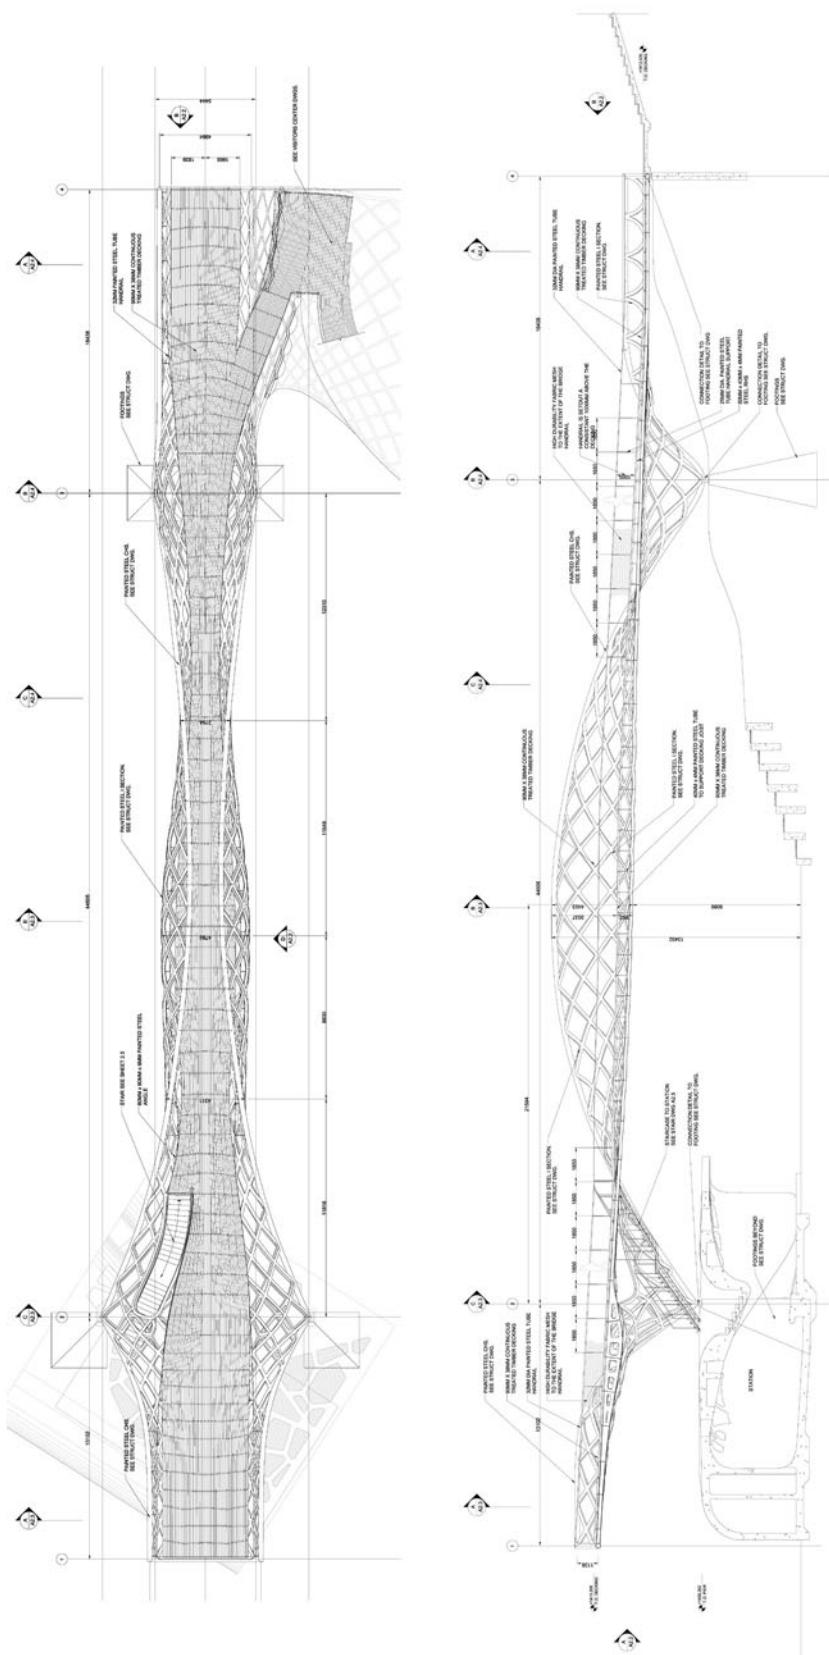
The Fen Qui Hu gridshell bridge on plan and on elevation
